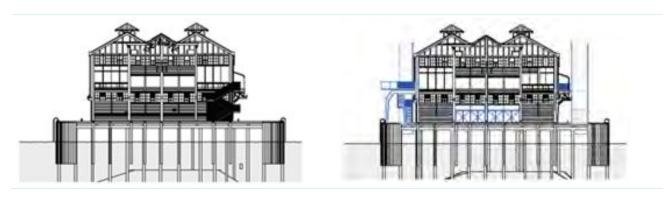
Existing and proposed north elevation to Wharf 4/5 (proposed alterations shown in blue)
